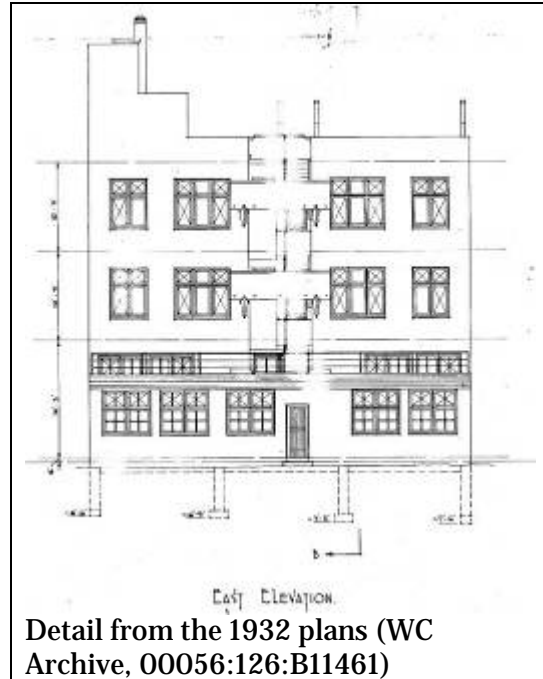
plans (WC Archive, 00056:126:B11461)
